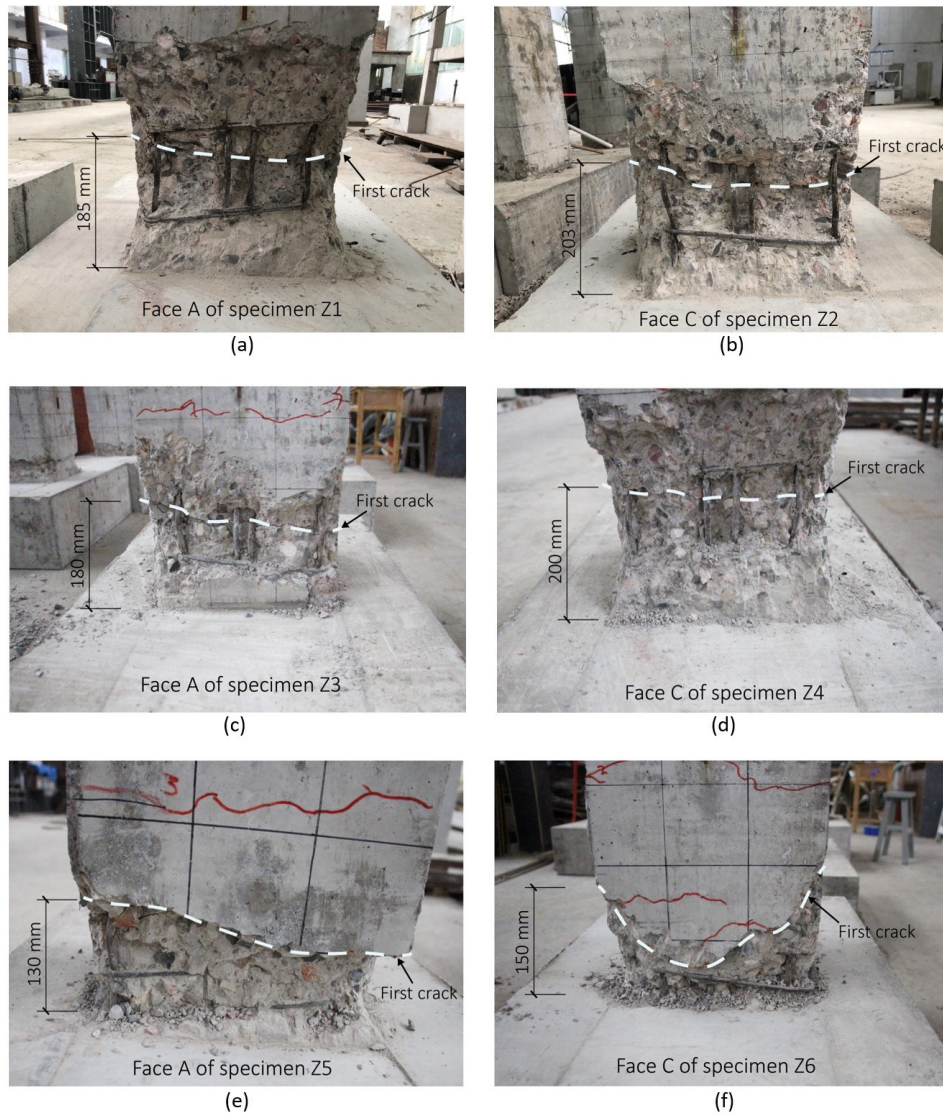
Failure modes of the test columns: (a) Z1; (b) Z2; (c) Z3; (d) Z4; (e) Z5; (f) Z6.
